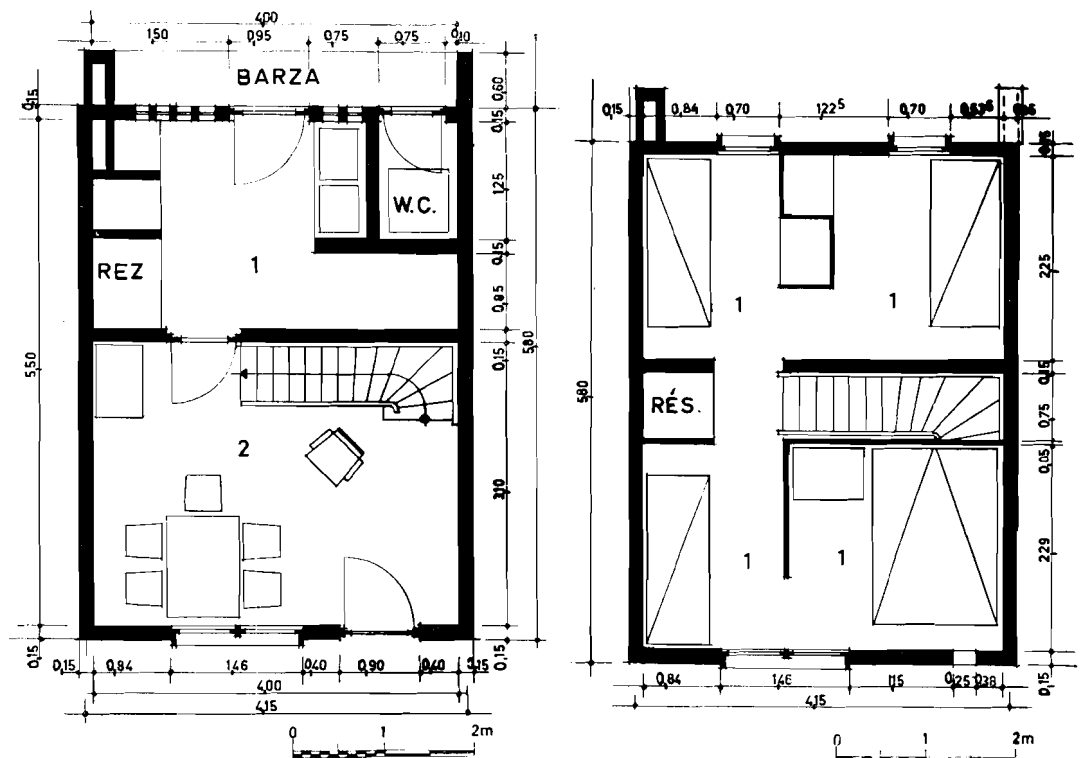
Office des Cités Africaines, former Belgian Congo (1954). Two-storey "terrace" house, Type T. 18. Floor area 44 m². (Left) 1 kitchen, 2 living-room. (Right) 1 rooms.
